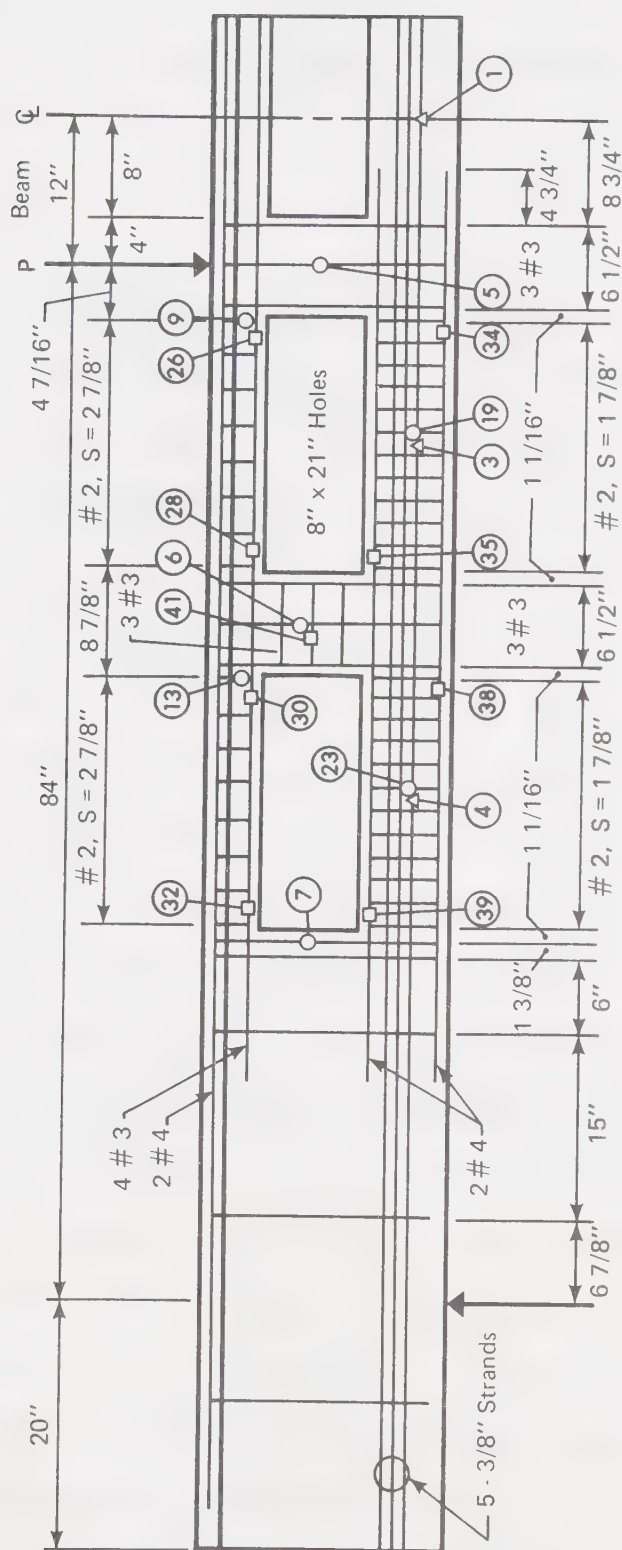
Reinforcement Details and Strain Gage Locations for Beam 30-21-7
